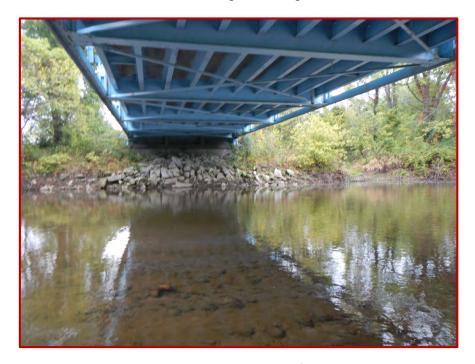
Looking north toward Wildcat Creek from beneath the bridge.
